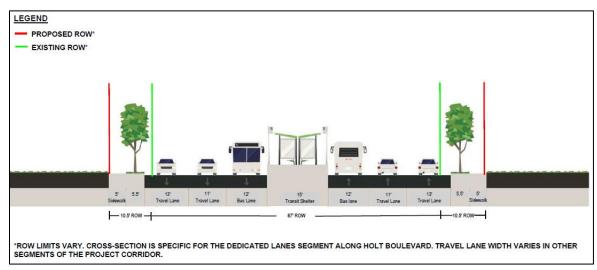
Typical Cross Section of Dedicated Lanes Segment for Alternative B along Holt Boulevard
